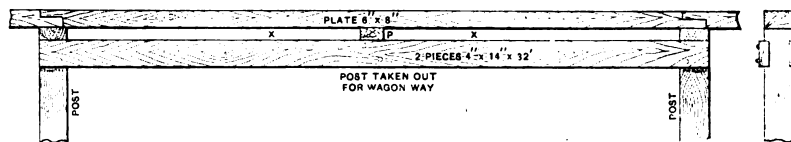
Views of Girder Plate Stiffened with Two Pieces Gained Into the Posts.
